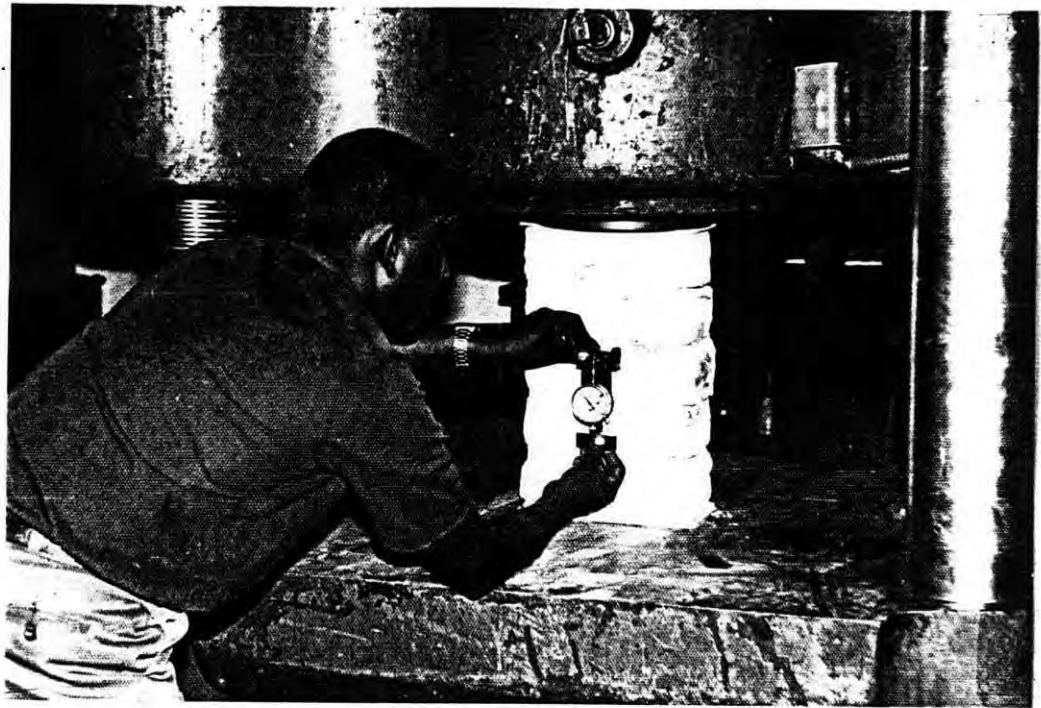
Testing Arrangement for Vertical Deformation of Brick.
